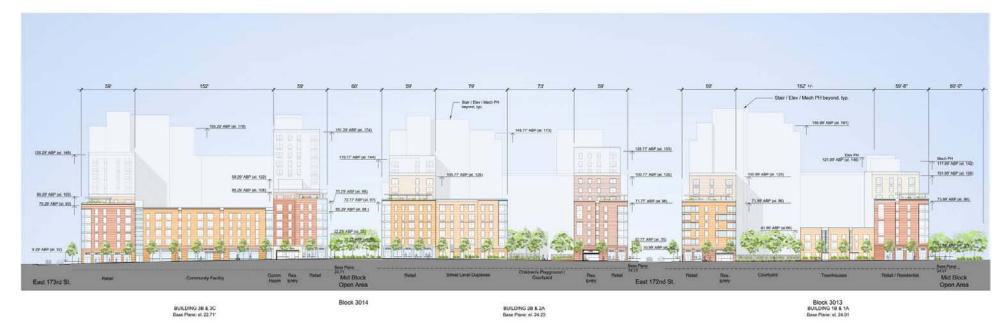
A - LSGD Buildings -- Boone Avenue Elevation
